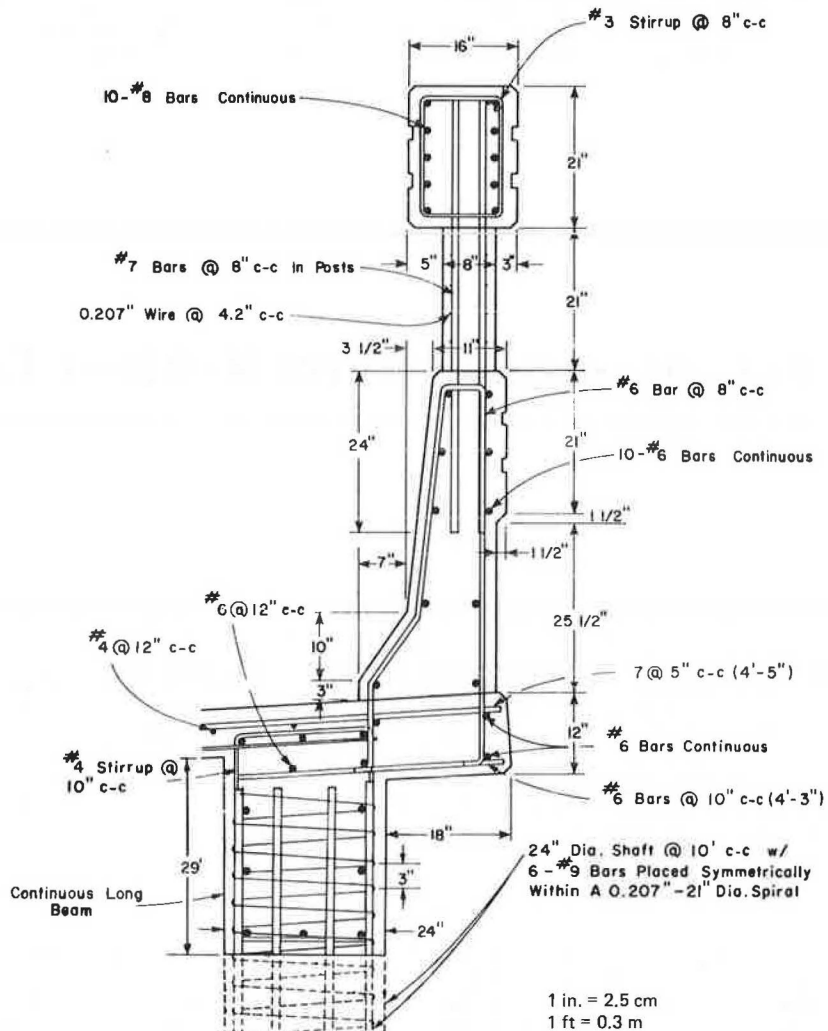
Cross section of modified T5 bridge rail and bridge deck.
